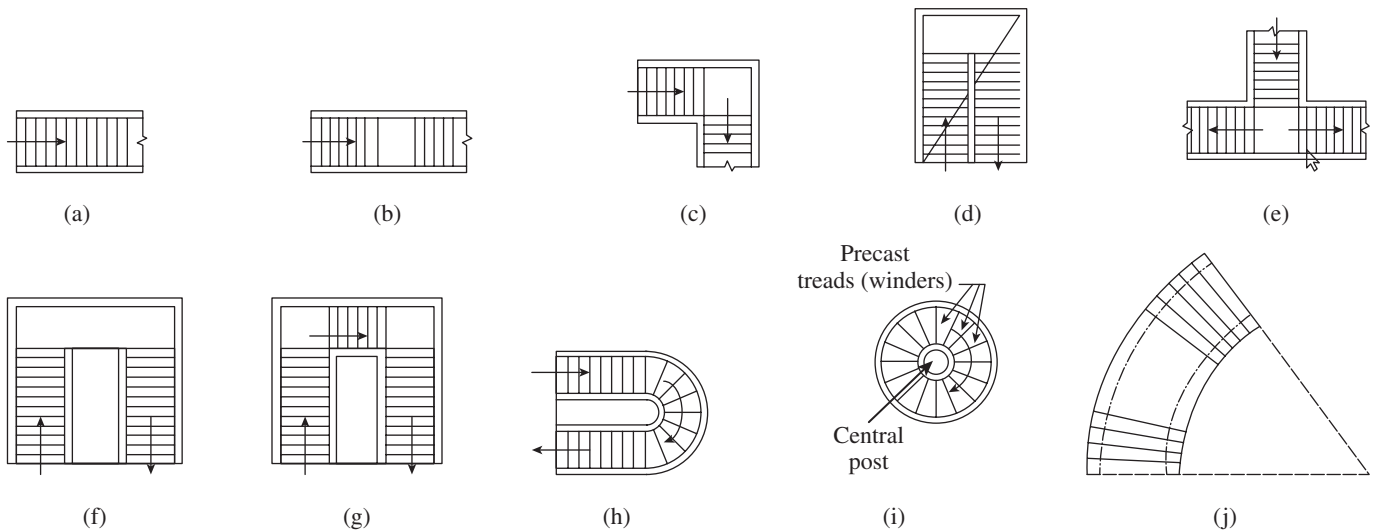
Plan views of various types of stairs (a) and (b) Straight flight stairs (c) Quarter-turn stairs (d) Half-turn stairs (e) Branching stairs (f) Open-well (half-turn) stairs (g) Open-well stairs with quarter-turn landing (h) Part-circular stairs (i) Spiral stairs (j) Helicoidal stairs
